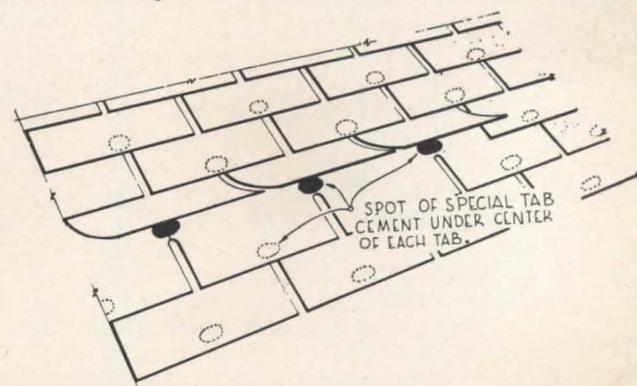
CEMENTING of shingle tabs is used for low-slope roofs and for roofs in windy areas
